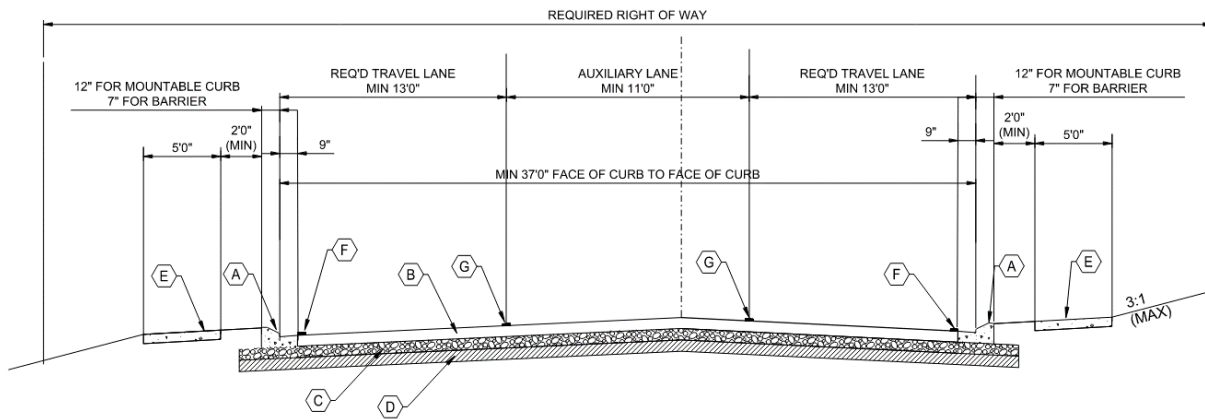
Cross Section Elements and Requirements for Curbed Roadway, 3-Lane Asphalt Concrete Pavement
